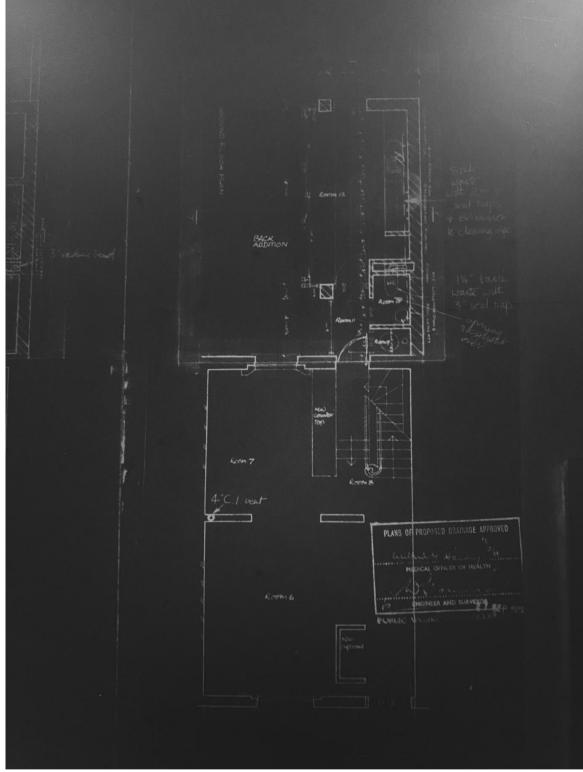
An extract of a 1968 proposed drawing of the ground floor of 79 Albert Street.
